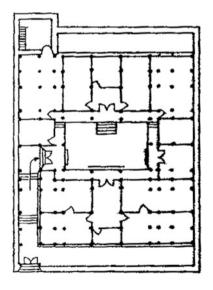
Typical plan drawing of a Tunpu residential structure. These houses are introverted, enclosed and separate from each other. *Source* Wang (1998: 269)
